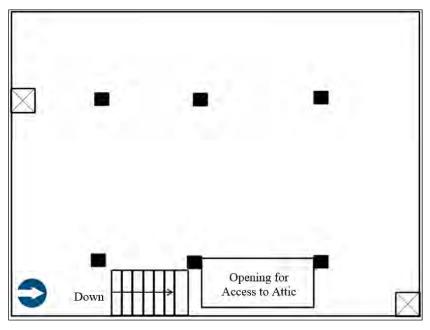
THIRD STORY PLAN (NOT TO SCALE)
